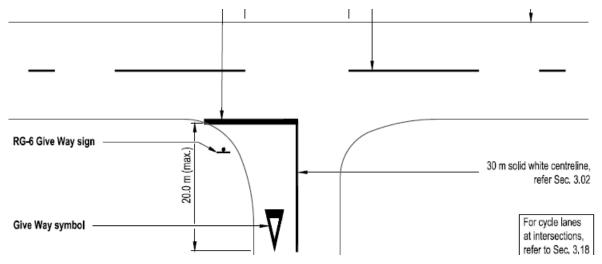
Typical layout of Give Way controlled intersection in New Zealand (Source: Manual of Traffic Signs and Markings, NZTA, March 2011)
